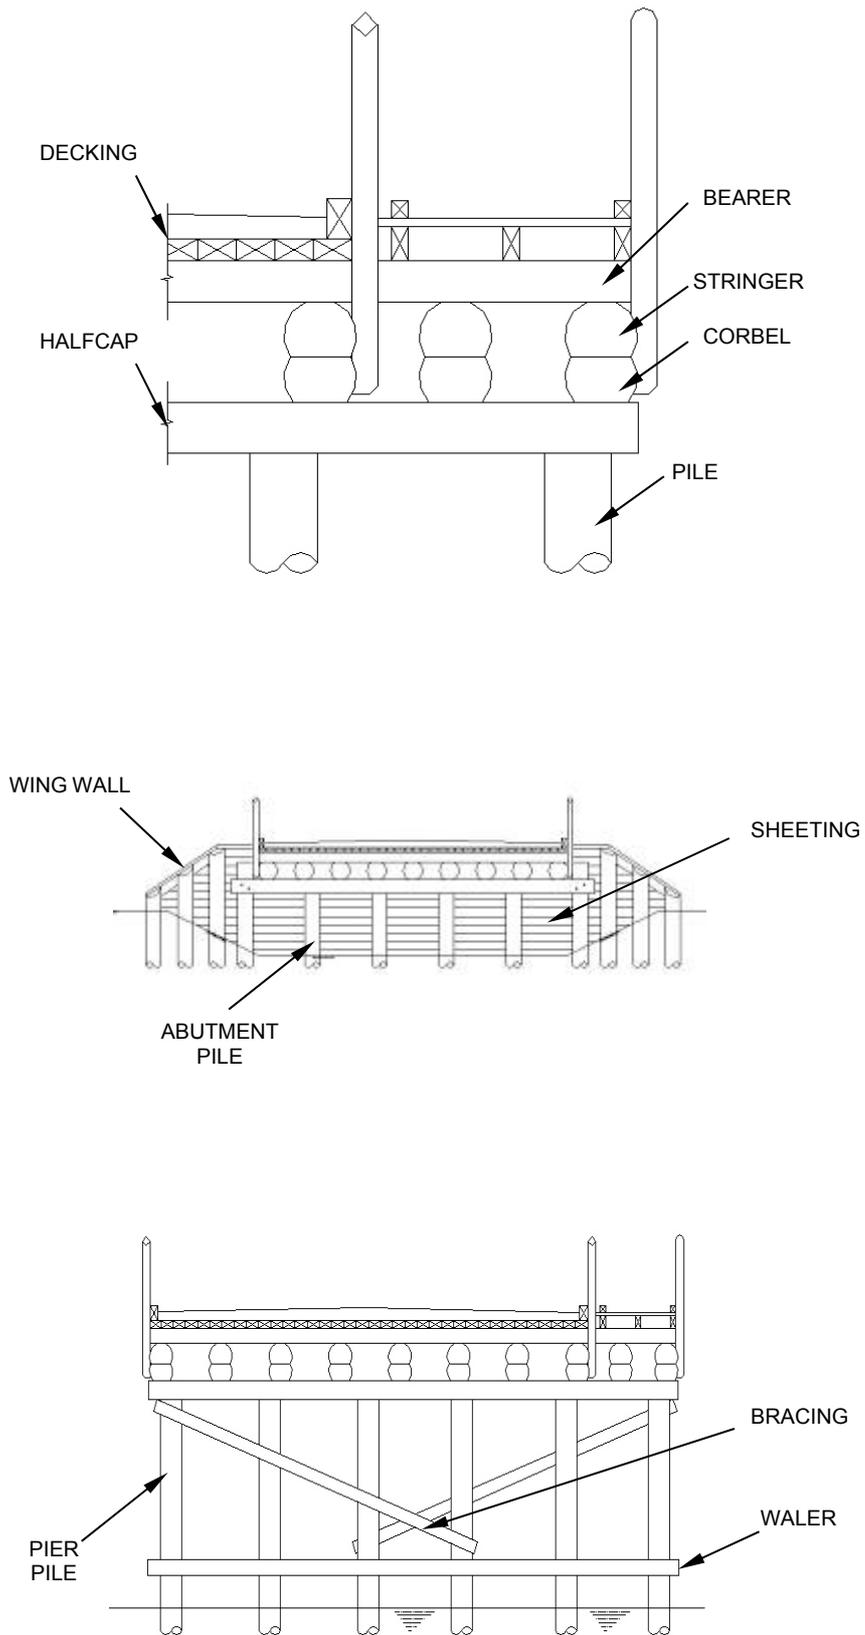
TIMBER BRIDGE COMPONENTS (Longitudinal Decking)
